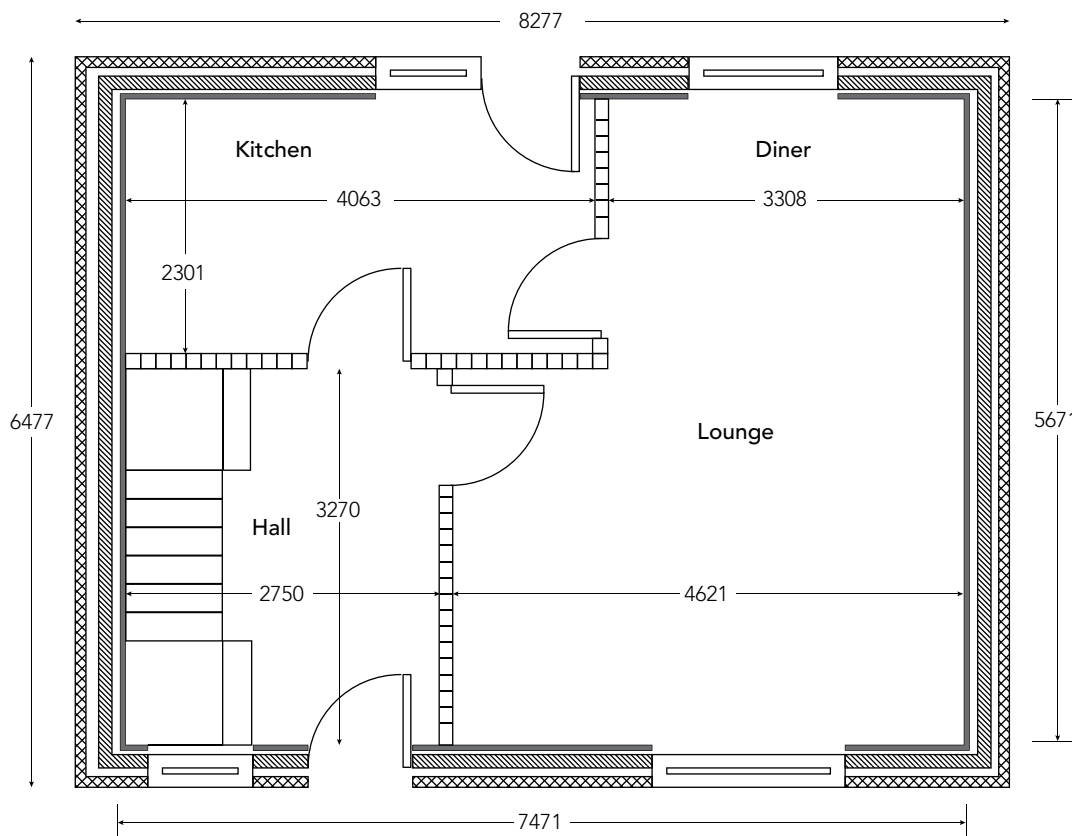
Ground floor plan for the BRE test houses (dimensions measured in millimetres)
